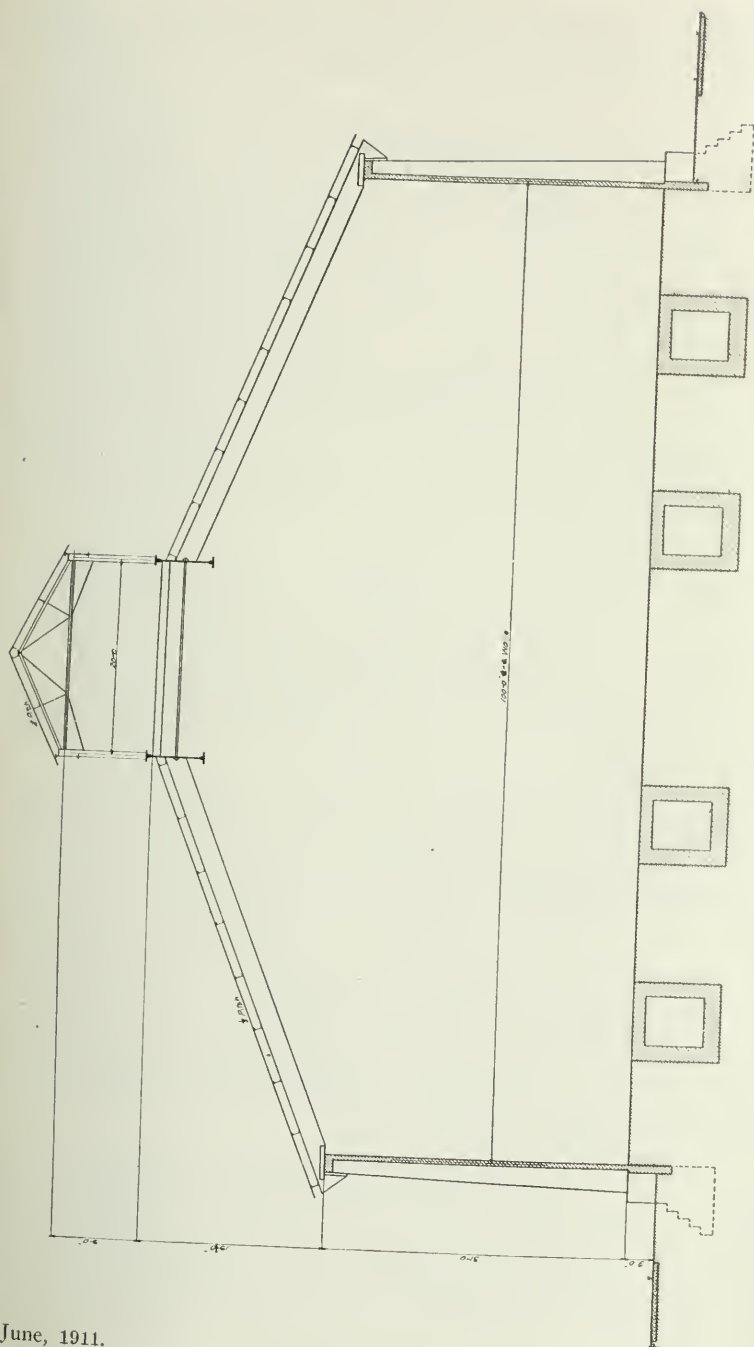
Plant No. 4. Reinforced Concrete Side Walls and Monitor Floor Supported on Longitudinal Girders.
